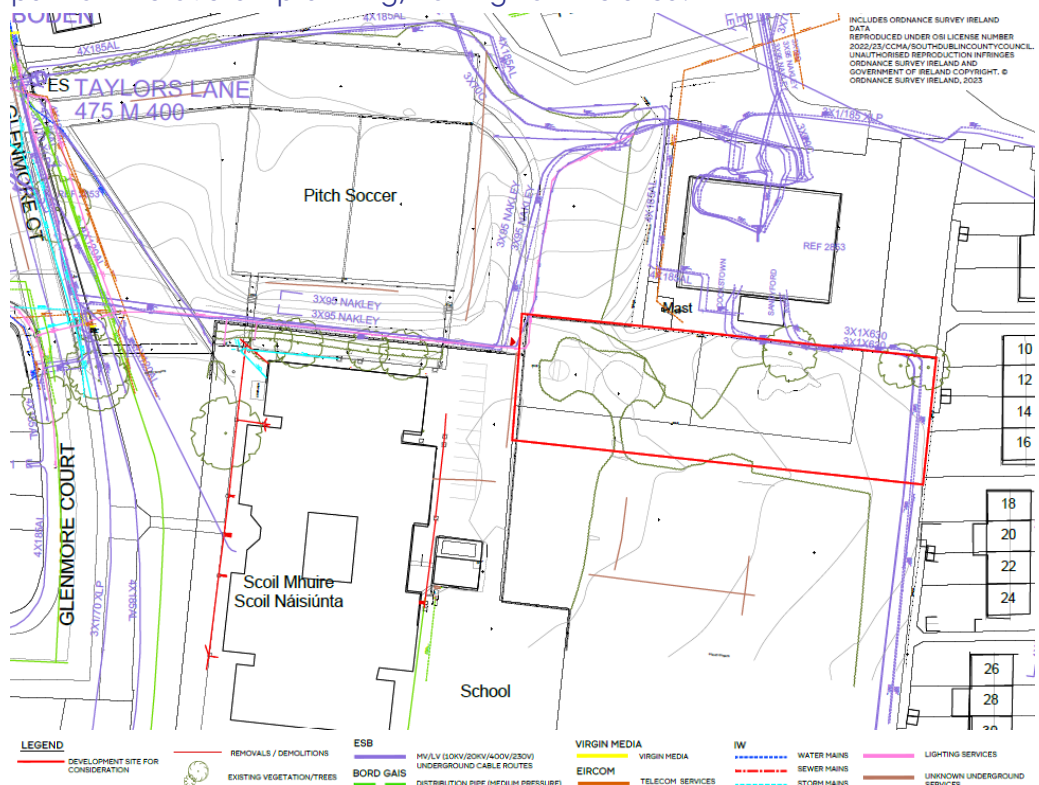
Extract from Site Constraints Drawing – Not to Scale
